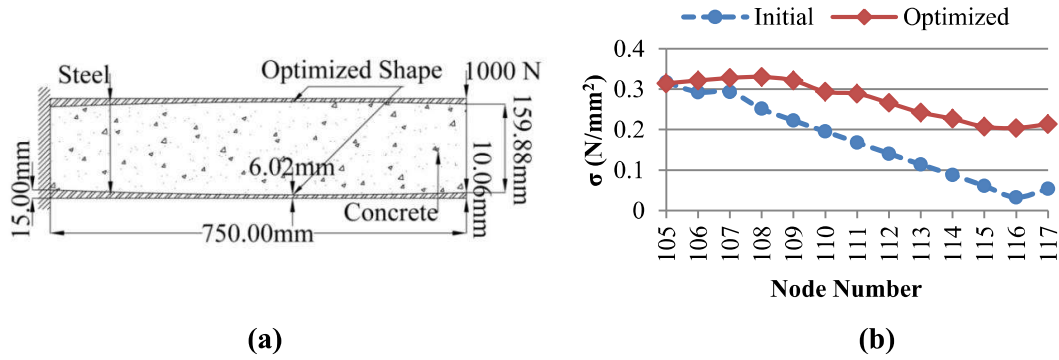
(a). Fixed cantilever SCS sandwich beam with point load (b). Shear stress distribution in fixed cantilever SCS sandwich beam having a point load
